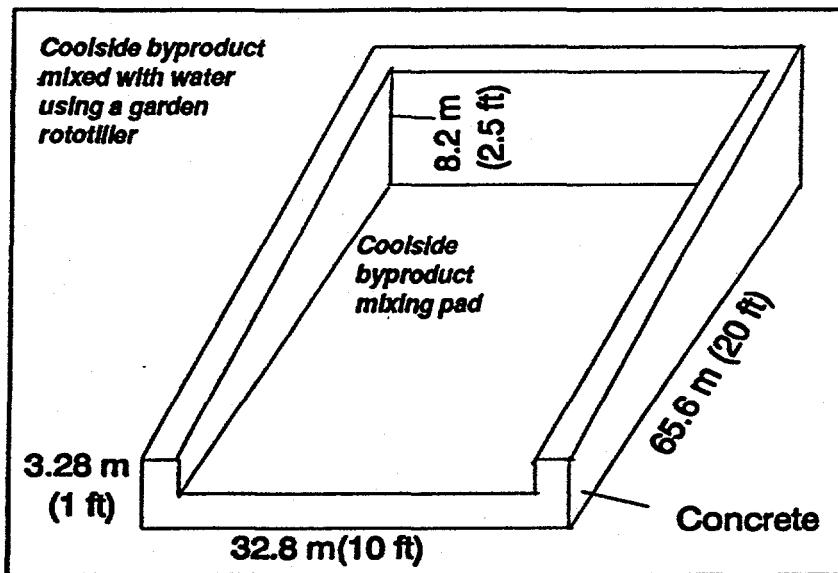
Configuration and dimensions of Coolside concrete mixing pad.
